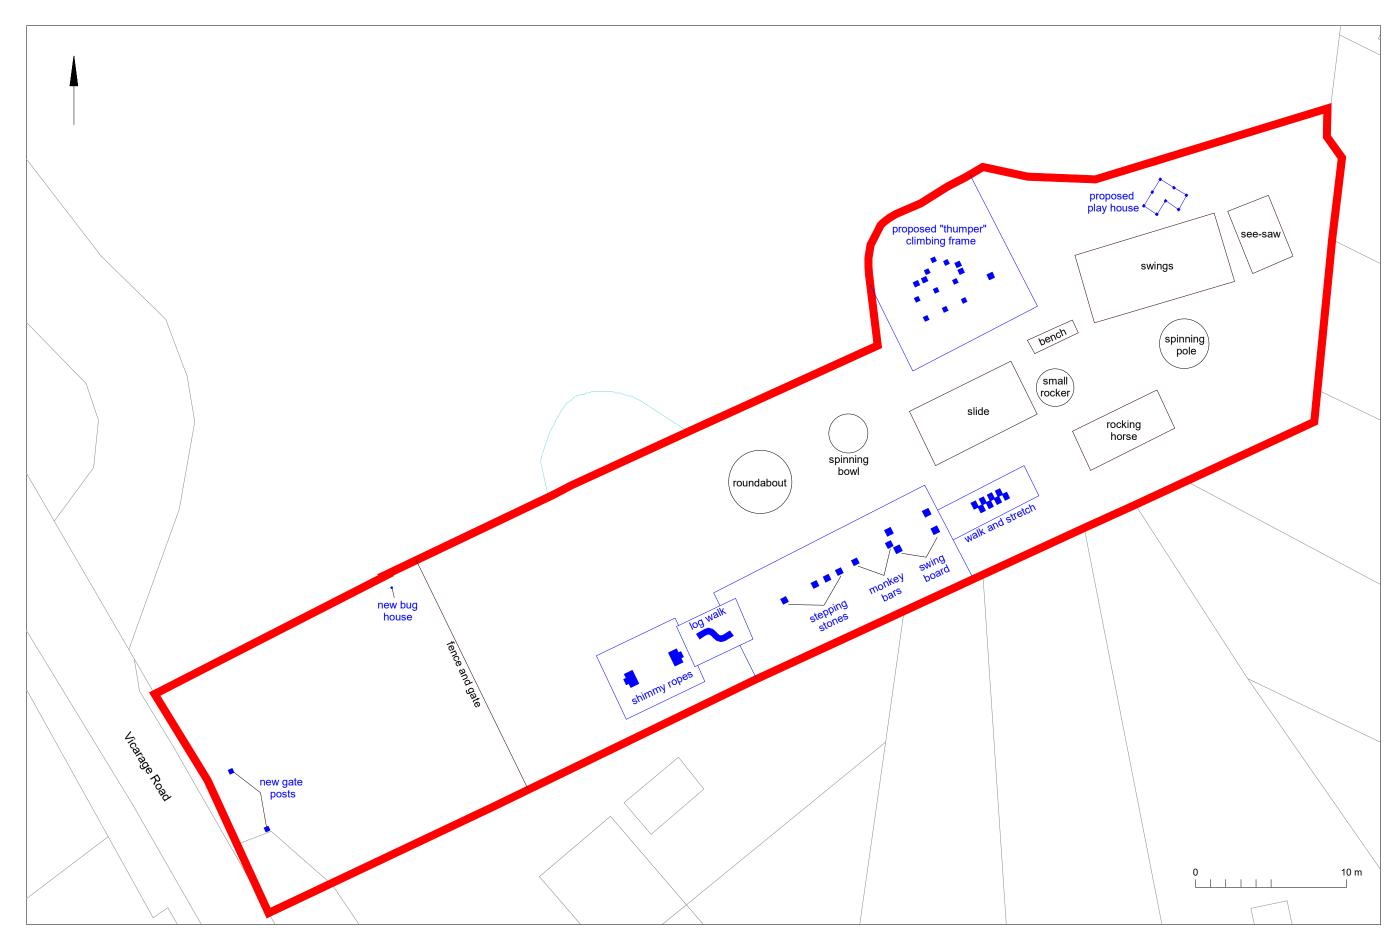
Site plan showing existing equipment (black) and proposed new equipment (blue).
